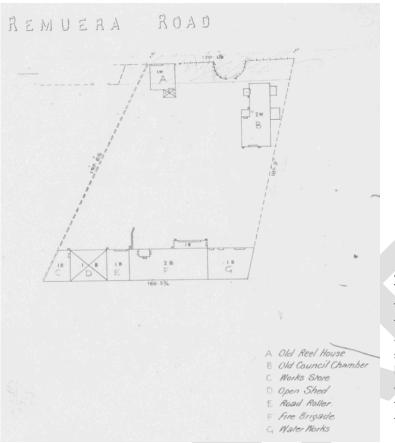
A plan showing the then Auckland City Council Corporation Yard/Works Depot and the buildings that occupied the site in 1915. Note the description of the subject building as single and two-storey brick structures, which largely align with the building as existing. Note also the uses of the different parts of the building at this time (refer to Appendix 1, Figure 9 for a fully referenced plan).
